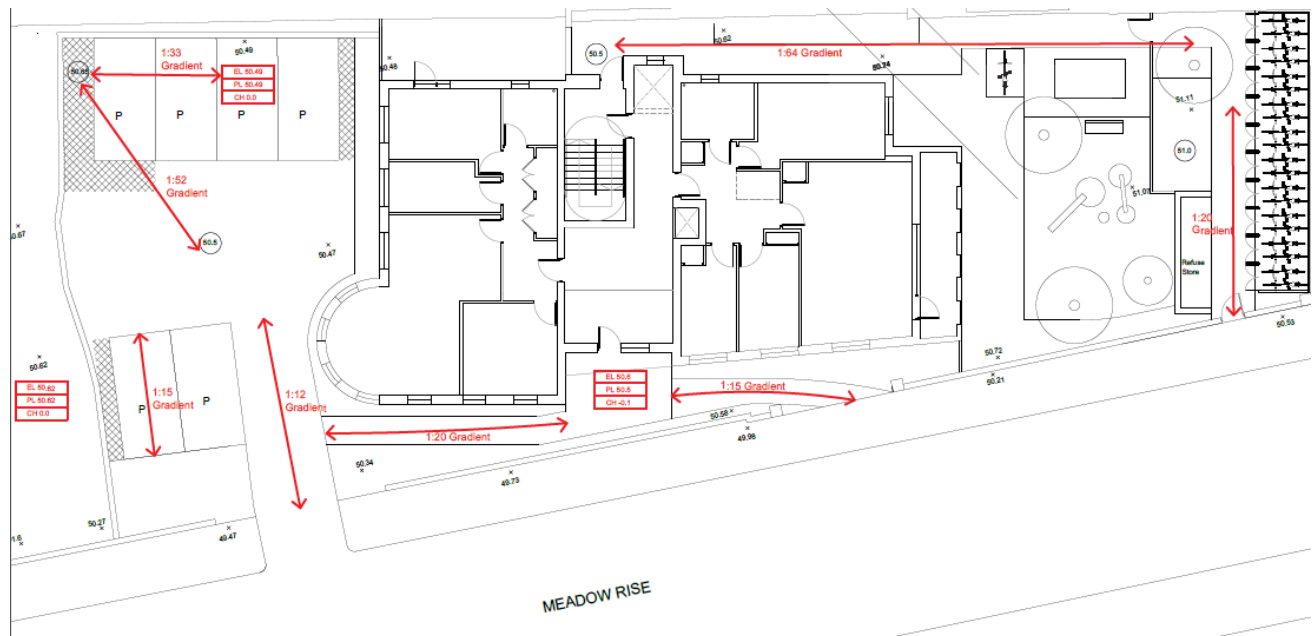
SDG guidance on corner plots and existing/proposed block plan
